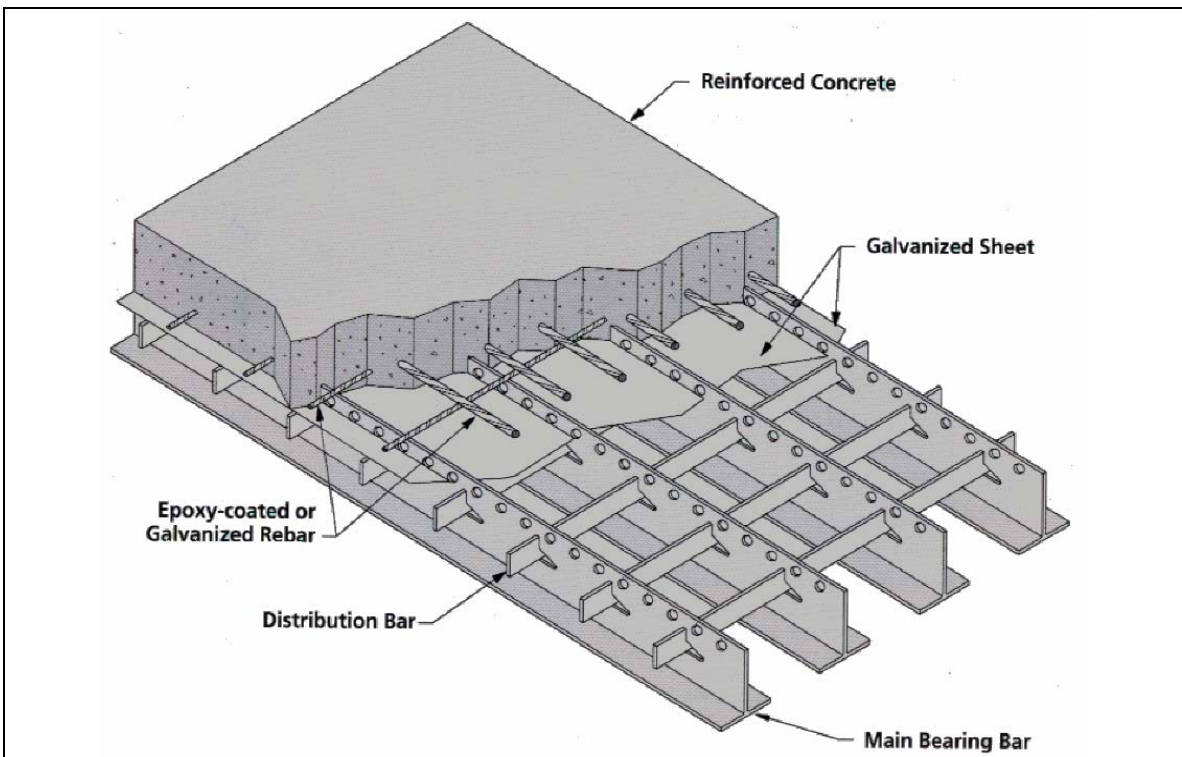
Exodermic Deck System revised design (Exodermic Bridge Deck, Inc., 1998)
